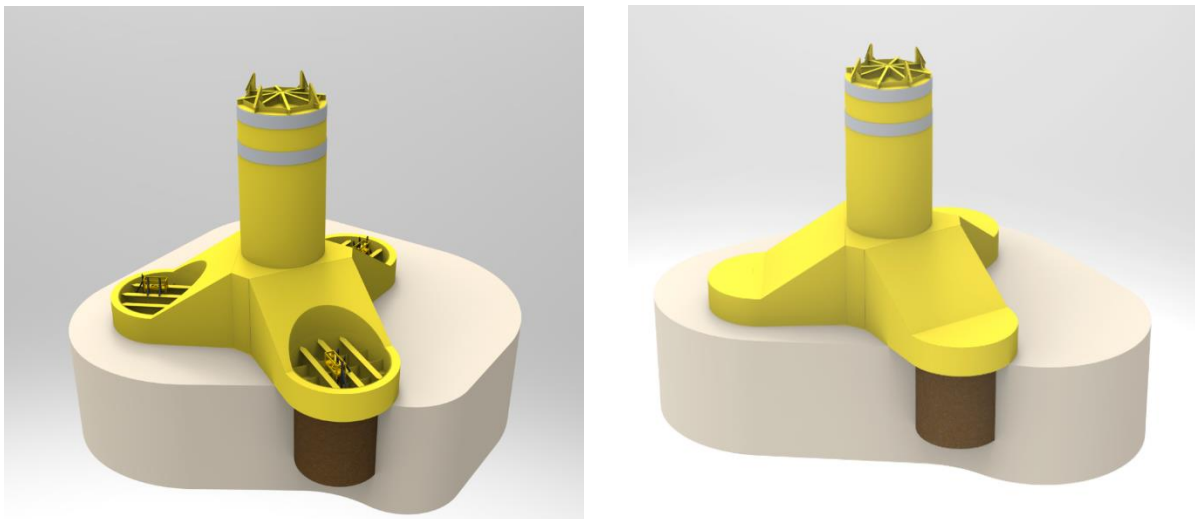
TSPC configuration: central column, connection beams and suction piles (SPT Offshore)
